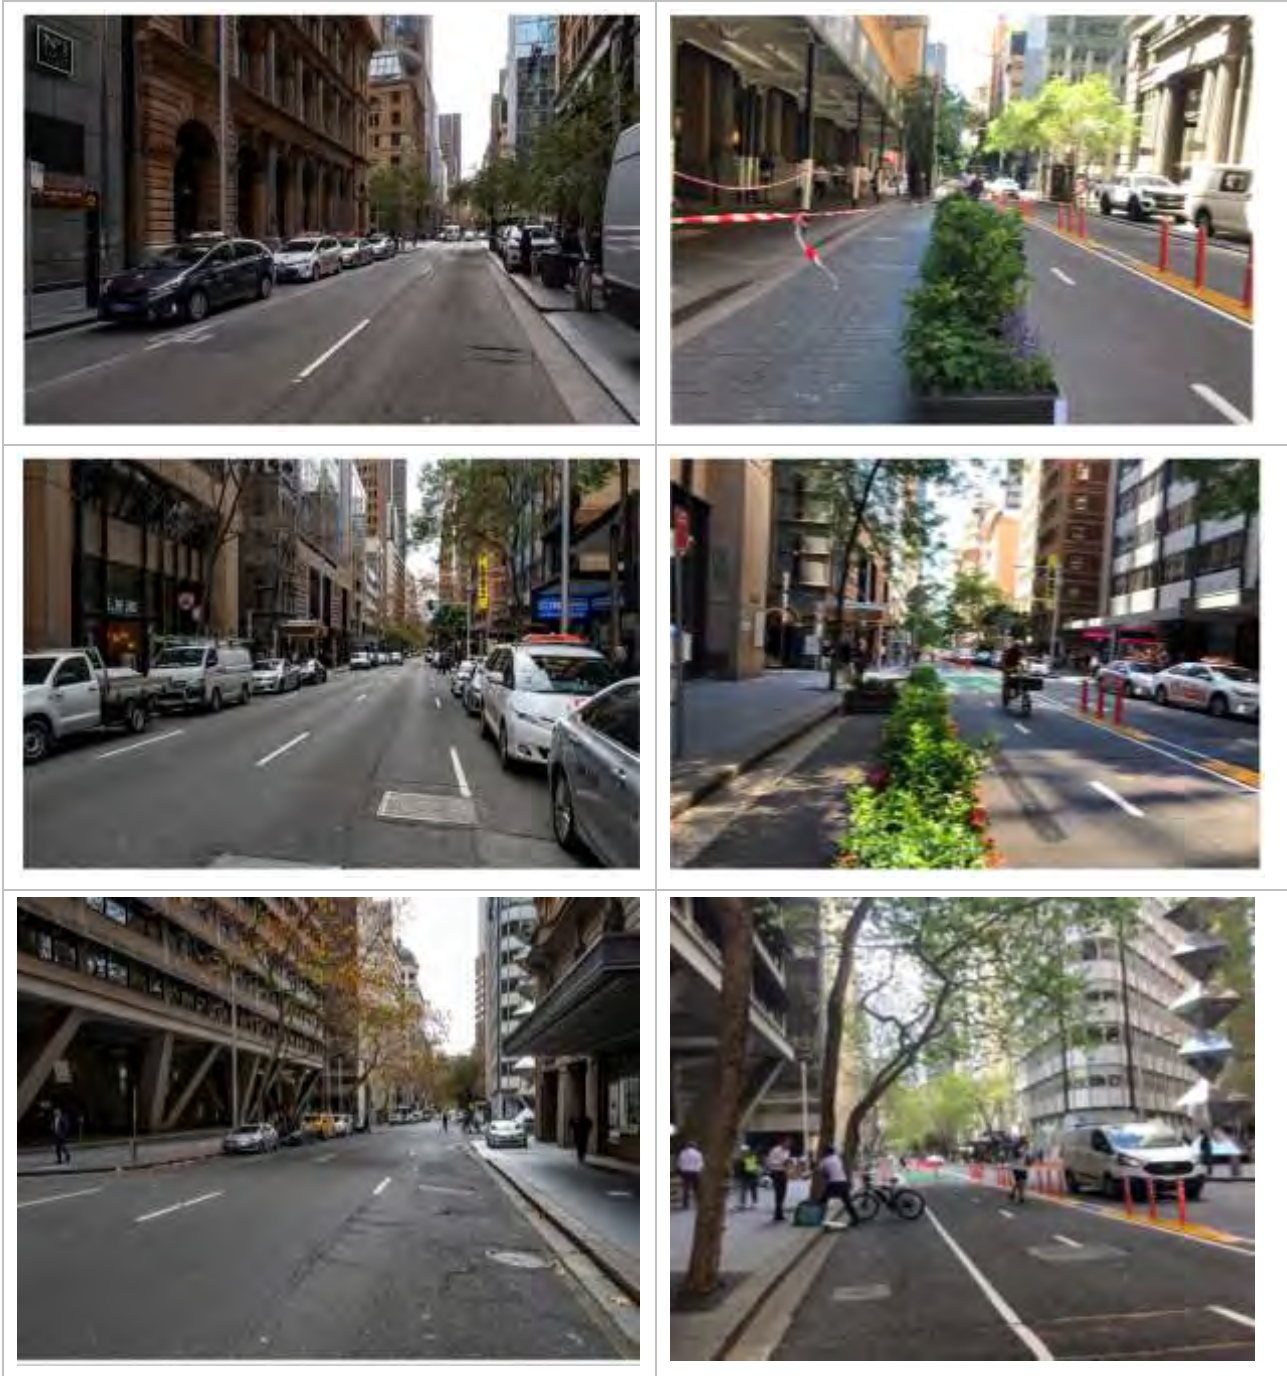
Before and After Photos – Pitt Street Cycleway (Source: City of Sydney, 2020)
